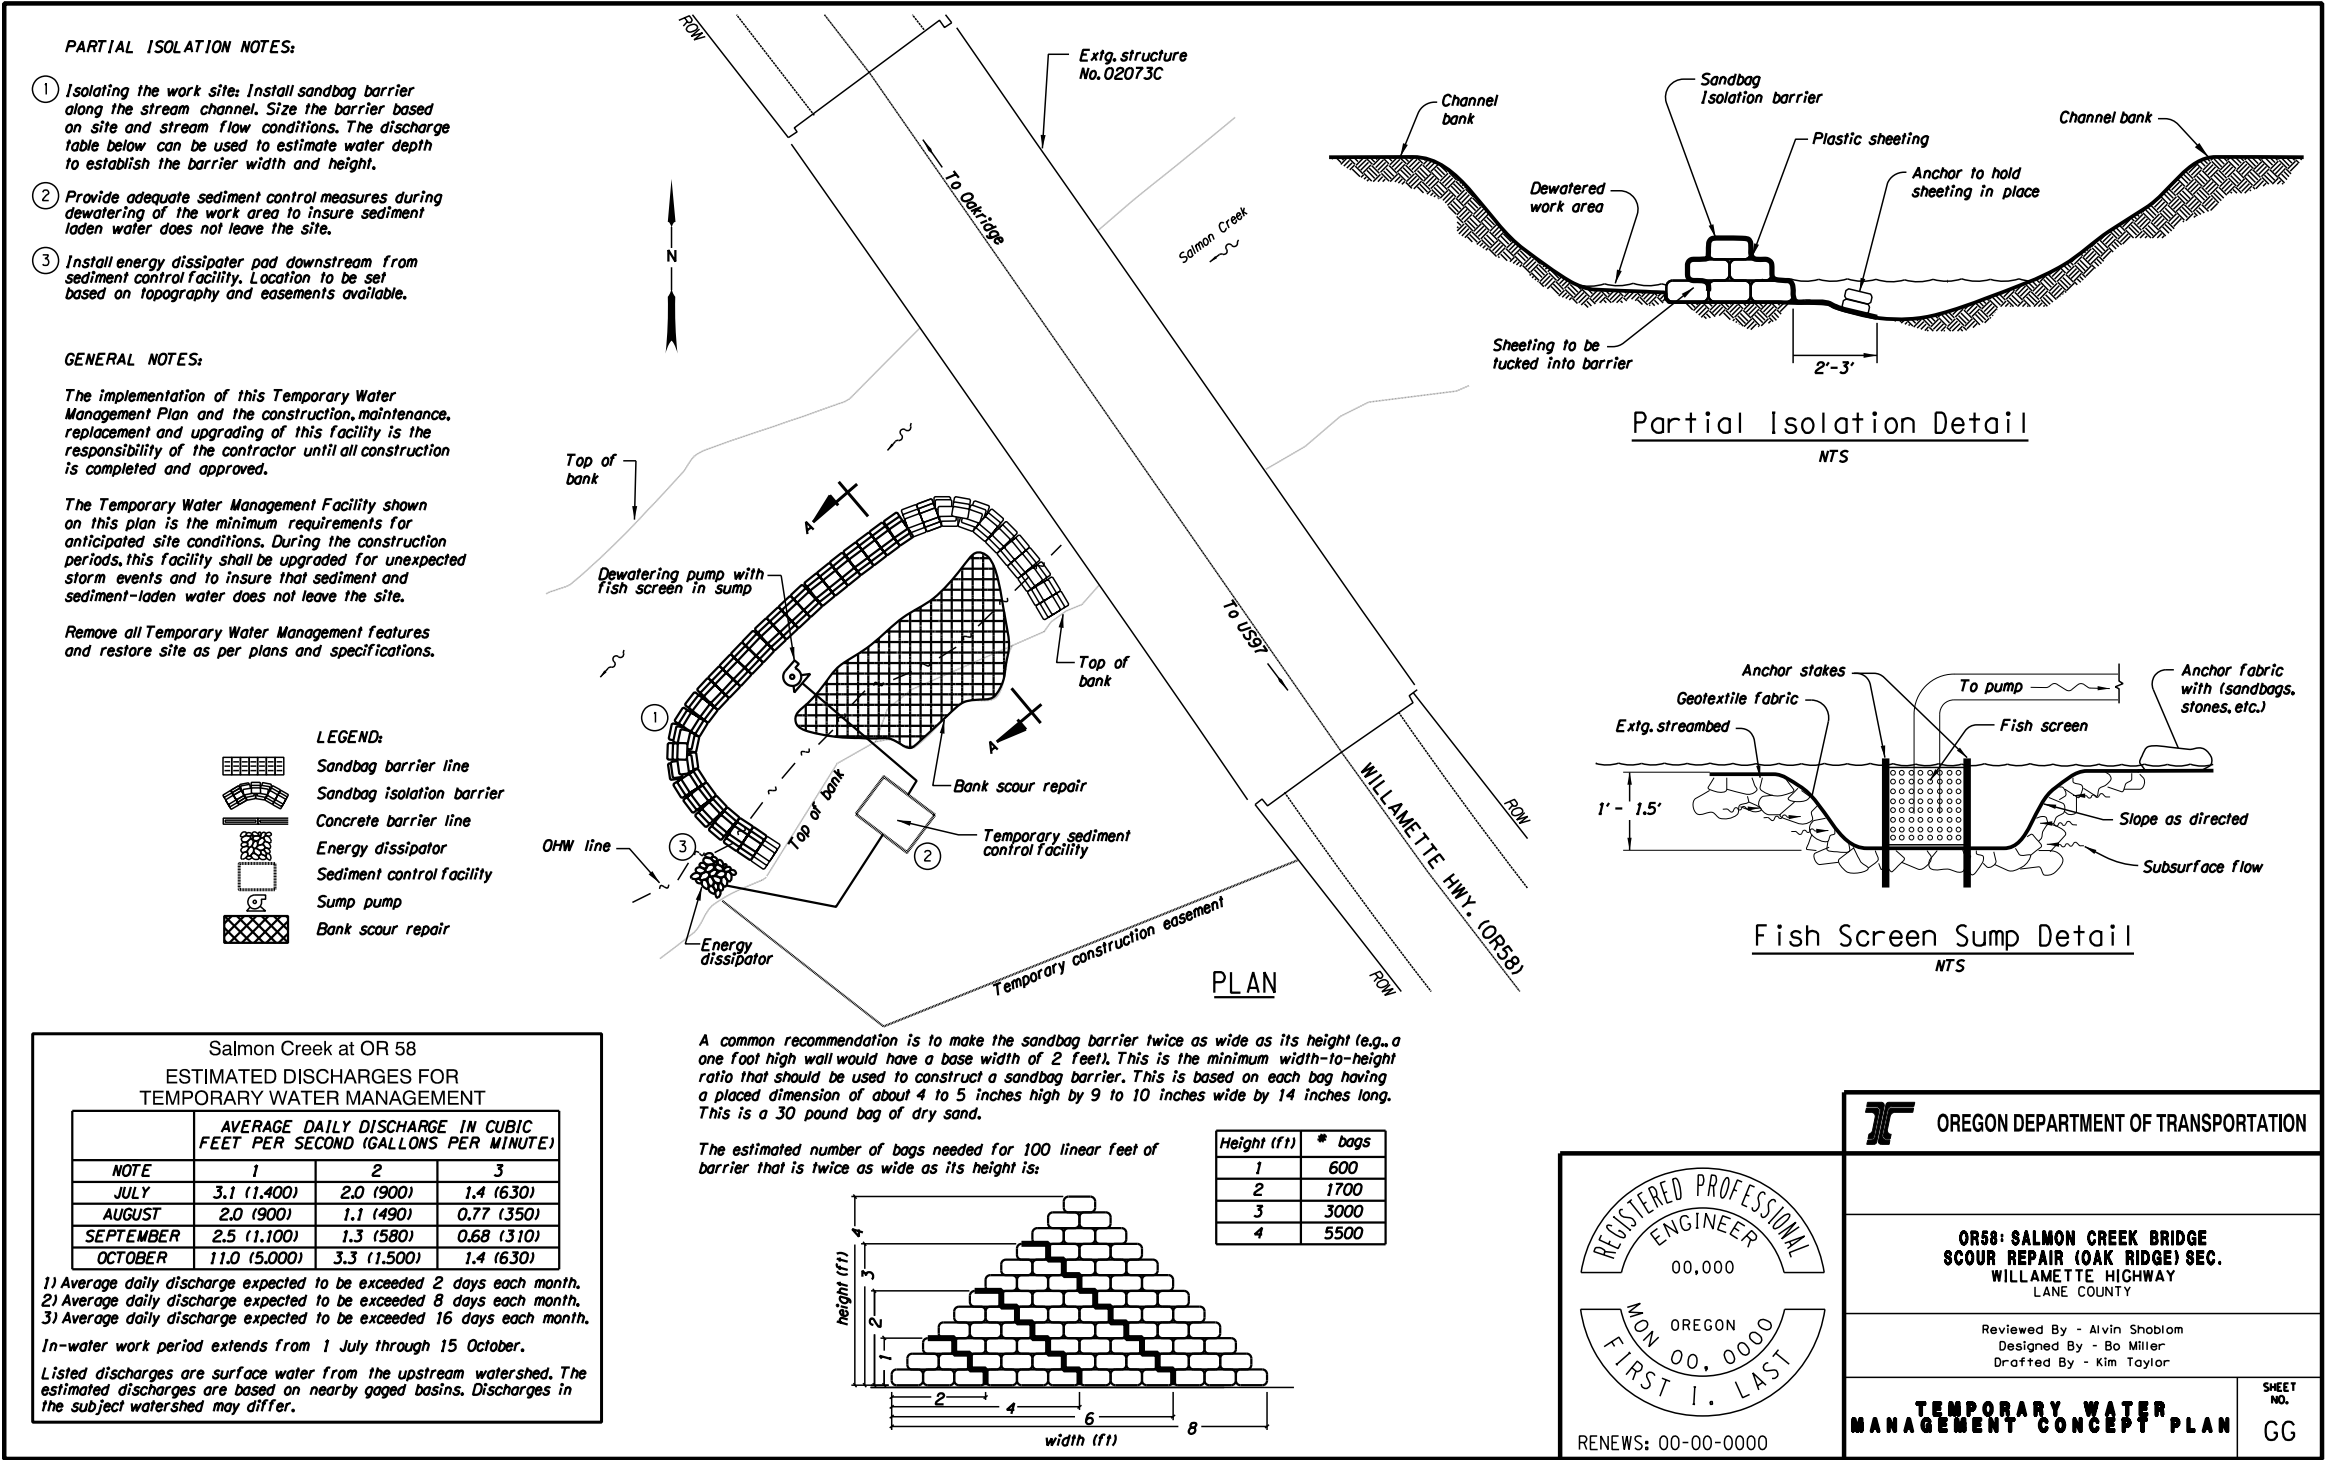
Example Drawing of a TWM Concept Plan (Partial Isolation)
